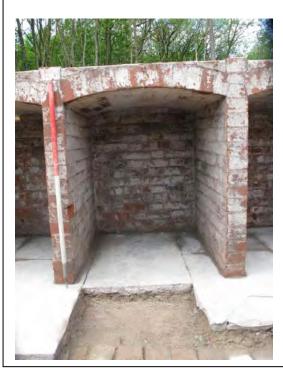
Vaulted ceiling of the sub basements (009) within Room B4.
